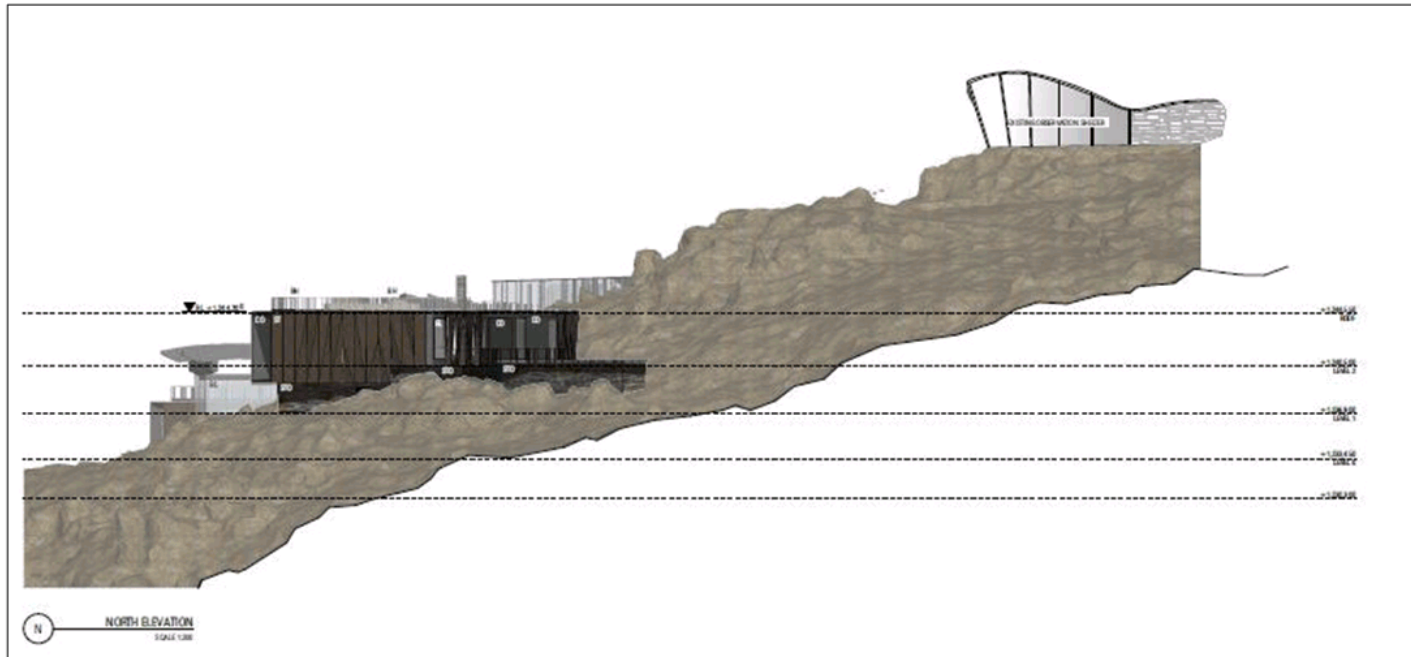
Building design from perspective of northern elevation, showing north and south sections of the building, the adjoining enclosed glass walkway, and the proposed obstructions on eastern face windows that may have posed a reflective risk
